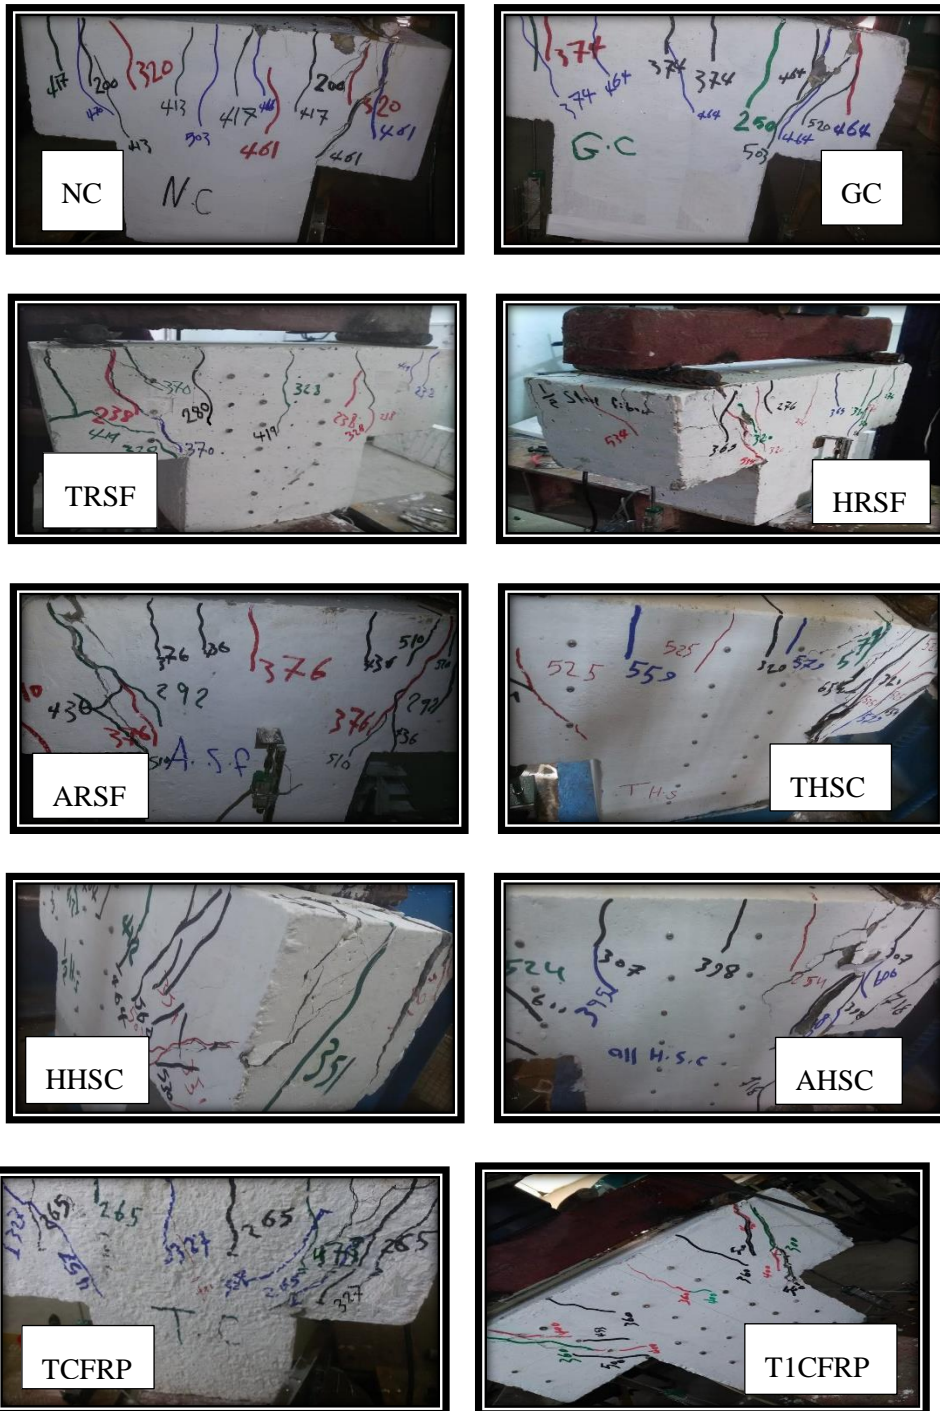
3Crack Patterns at the Failure Stage For Various Tested Pier Models
